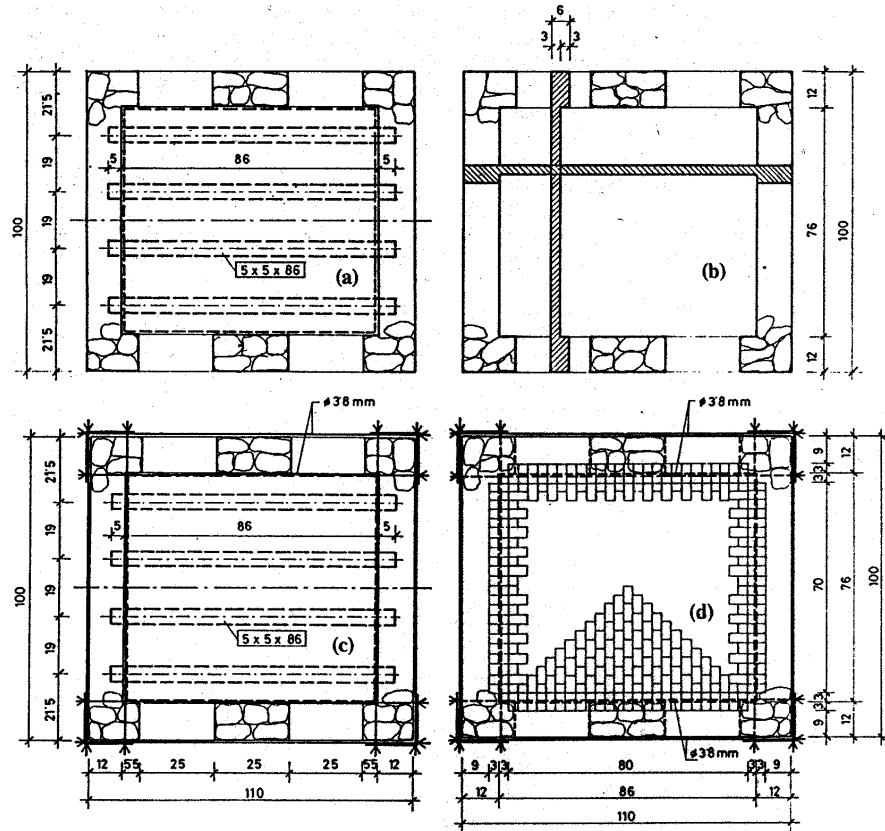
Floor and Roof systems of the tested models (units in cm) (Tomazevic et al. 1993)
